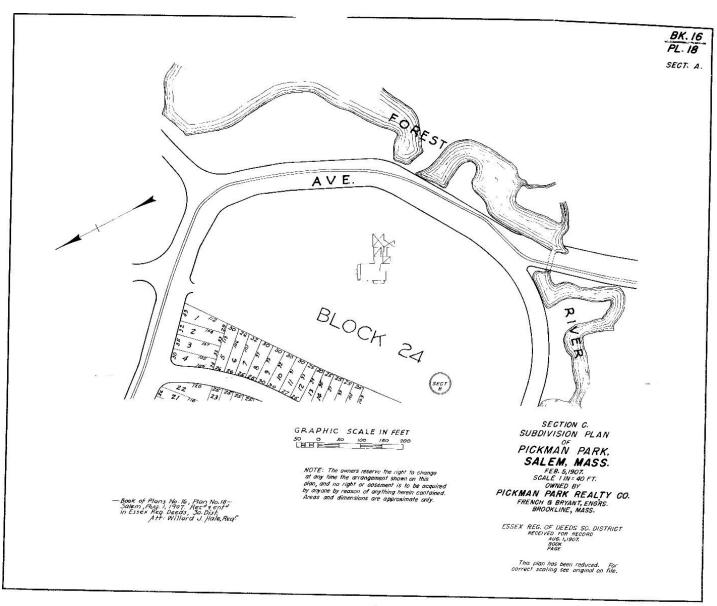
The first section of the 1907 plan showing the Loring Villa on its newly subdivided lot. Source: Southern Essex District Registry of Deeds, recorded plans bk. 16, pl. 18, section A (1907).
